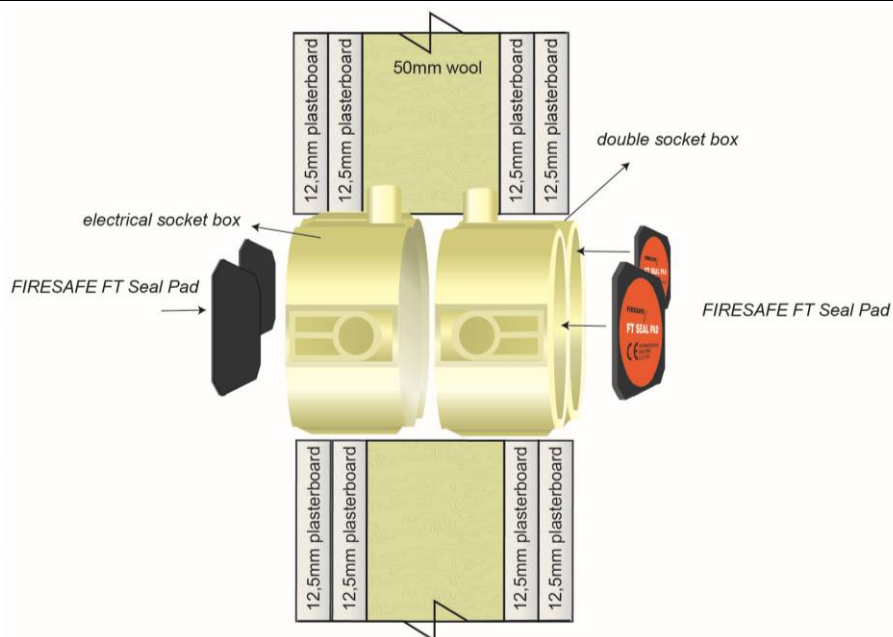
Double electrical wall box in flexible wall, fitted back to back – sectional view
